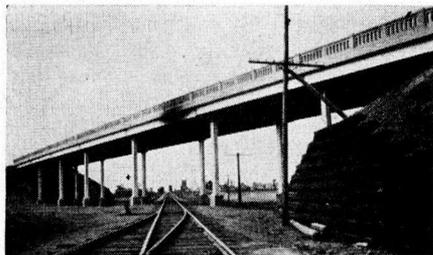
Open Timber Cribbing. Courtesy of Amer. Wood Preservers Assn.
